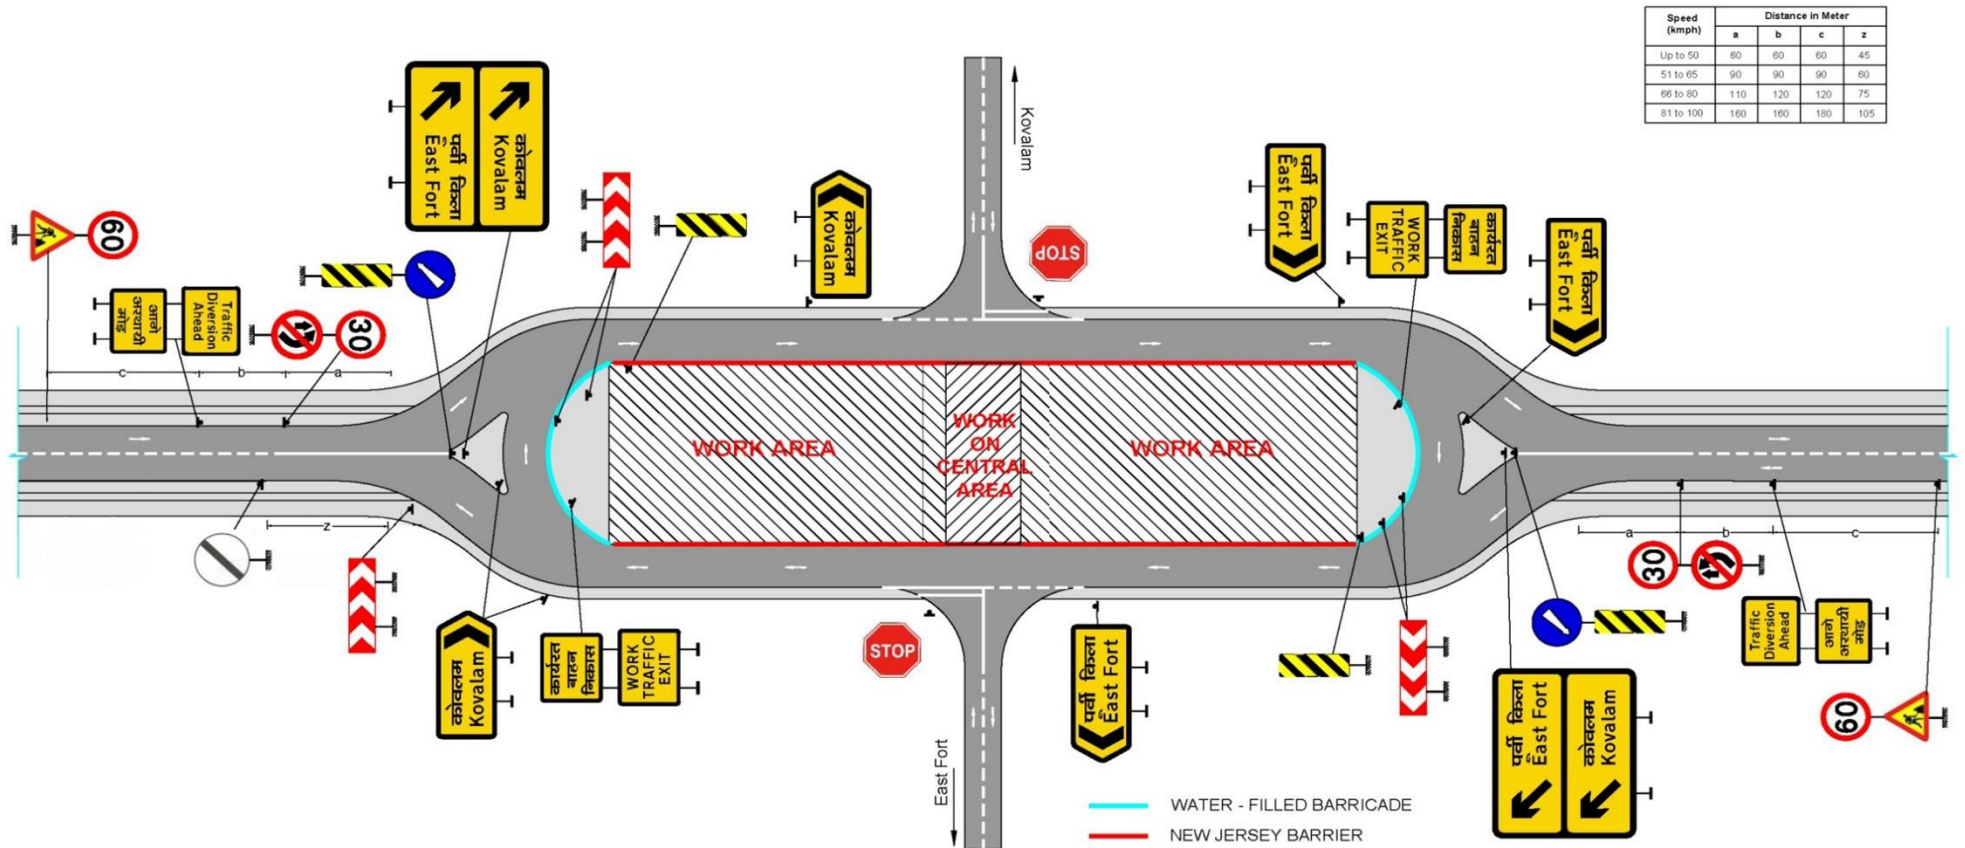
Stage-2 of Flyover/VUP Construction
